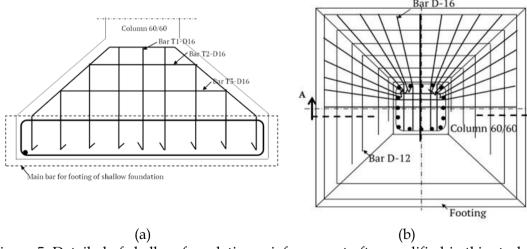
Detailed of shallow foundation reinforcement after modified in this study: (a) Top view of footing reinforcement, (b) Bottom view of footing reinforcement
